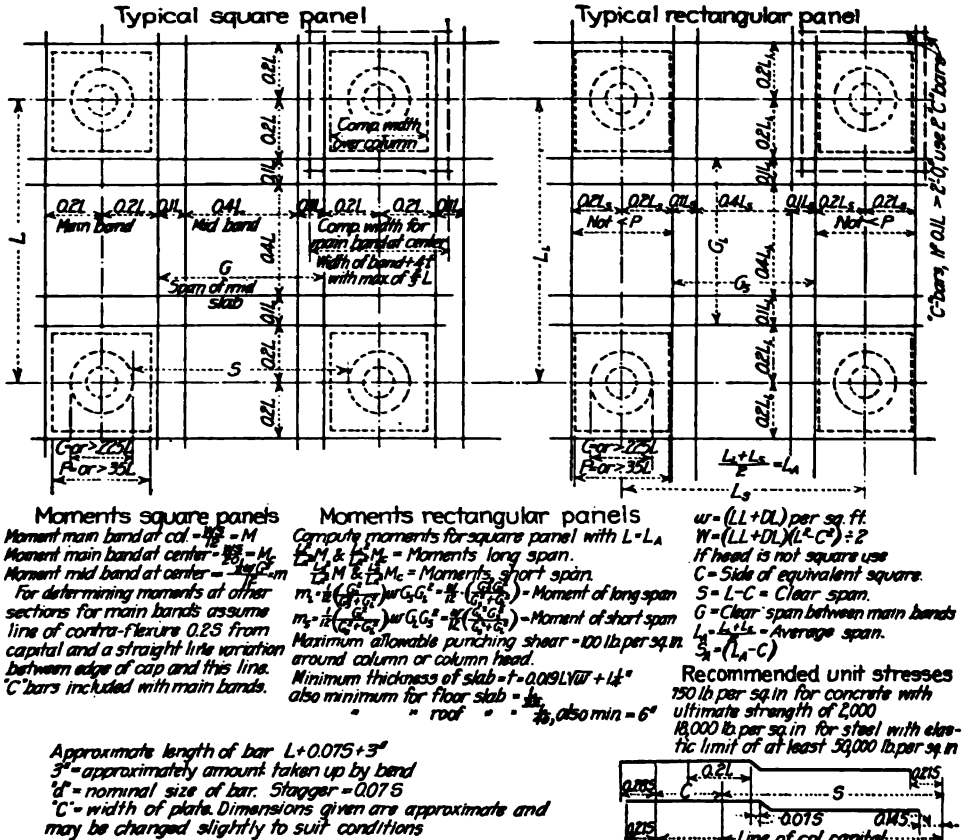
Akme system. Drop panel type. Design standards, Condron Co.
